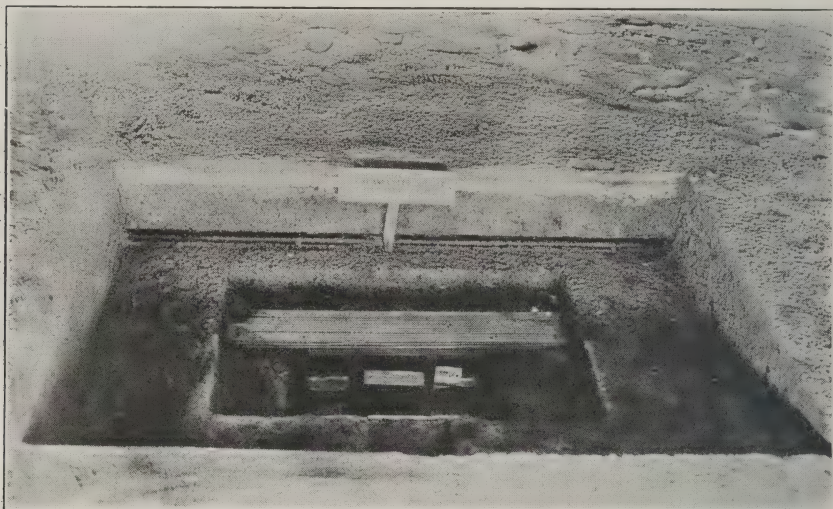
Cut and Cover Shelter. Cover: 6 inches earth, 8 inches concrete, 2 feet earth, steel rails, 18 inches earth, heavy squared timbers.
